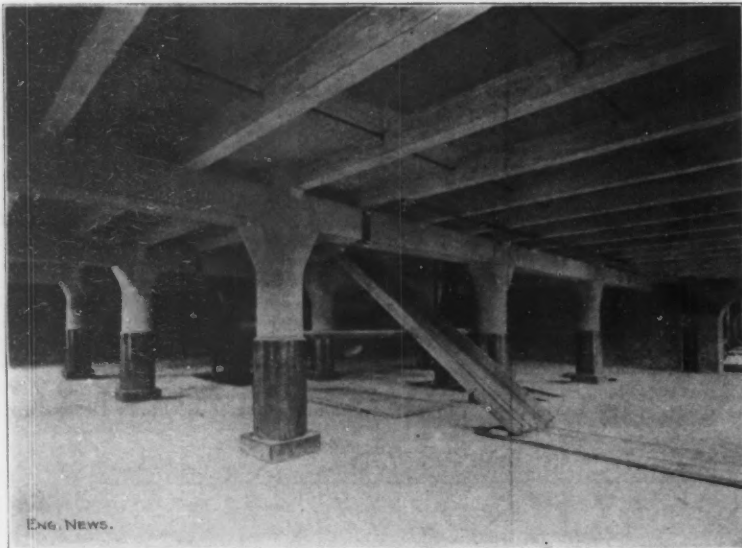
INTERIOR VIEW OF THE NEW YORK SUGAR REFINING CO.'S NEW REFINERY, SHOWING FIREPROOF FLOORS AND COLUMN AND BEAM FIREPROOFING.
